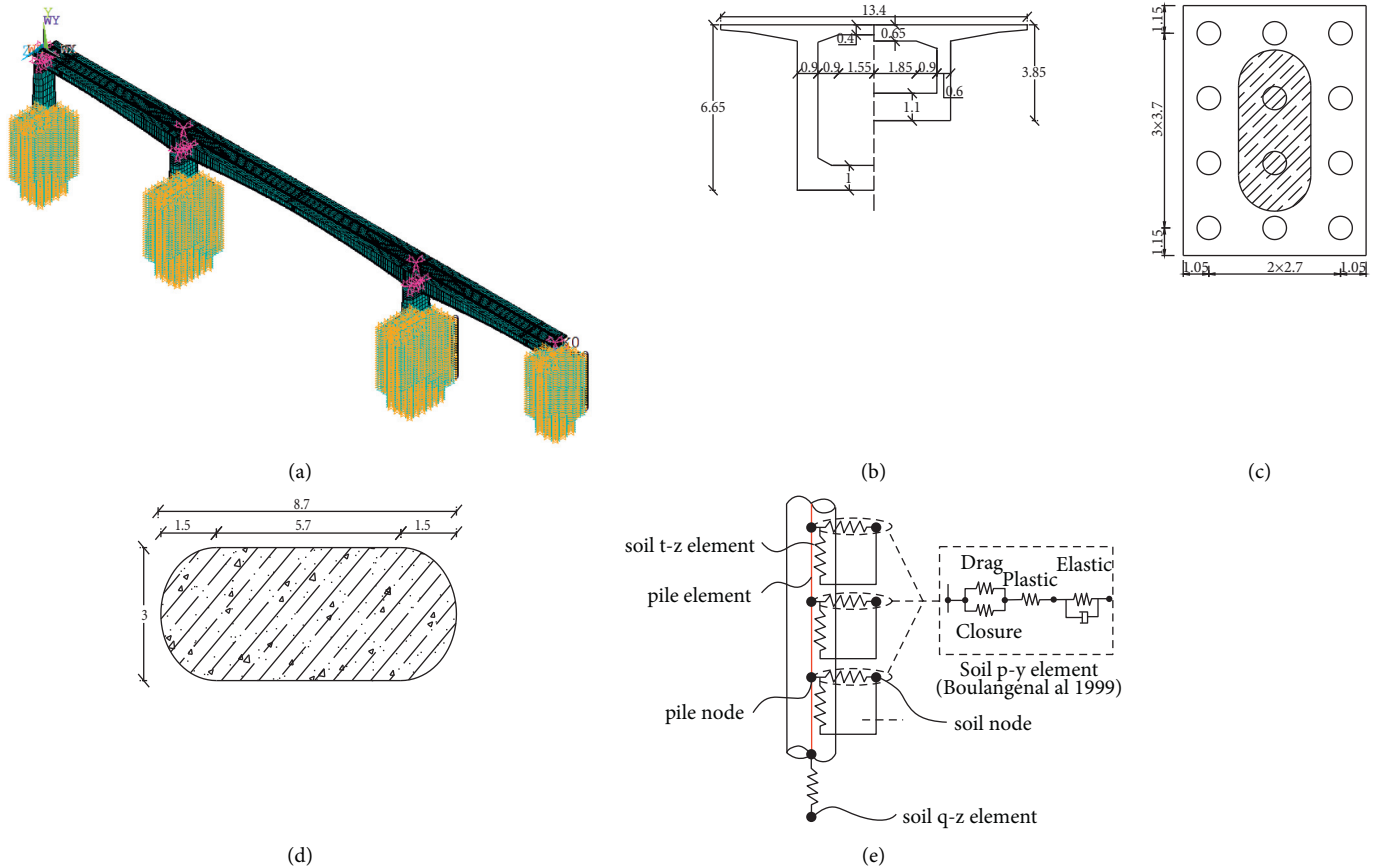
Typical bridge sections. (a) Bridge structure, (b) girder section, (c) bearing section, (d) pier section, and (e) pile-soil interaction model.
